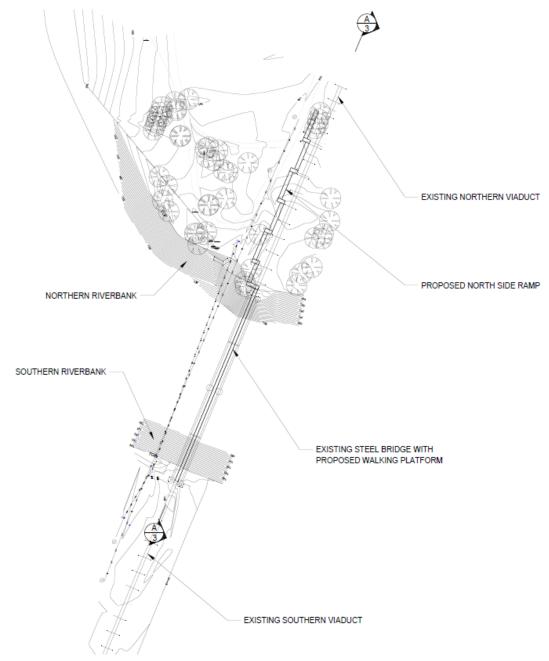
Extract: Site Plan (Source: ACME, 2021)
